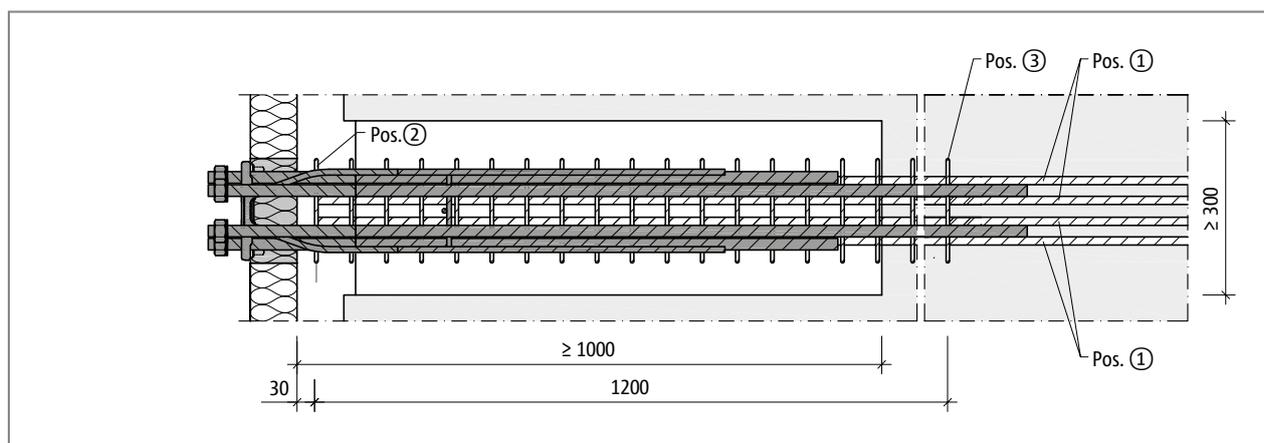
Schöck Isokorb® T type SK-MM2: On-site reinforcement for semi-precast construction, plan view
